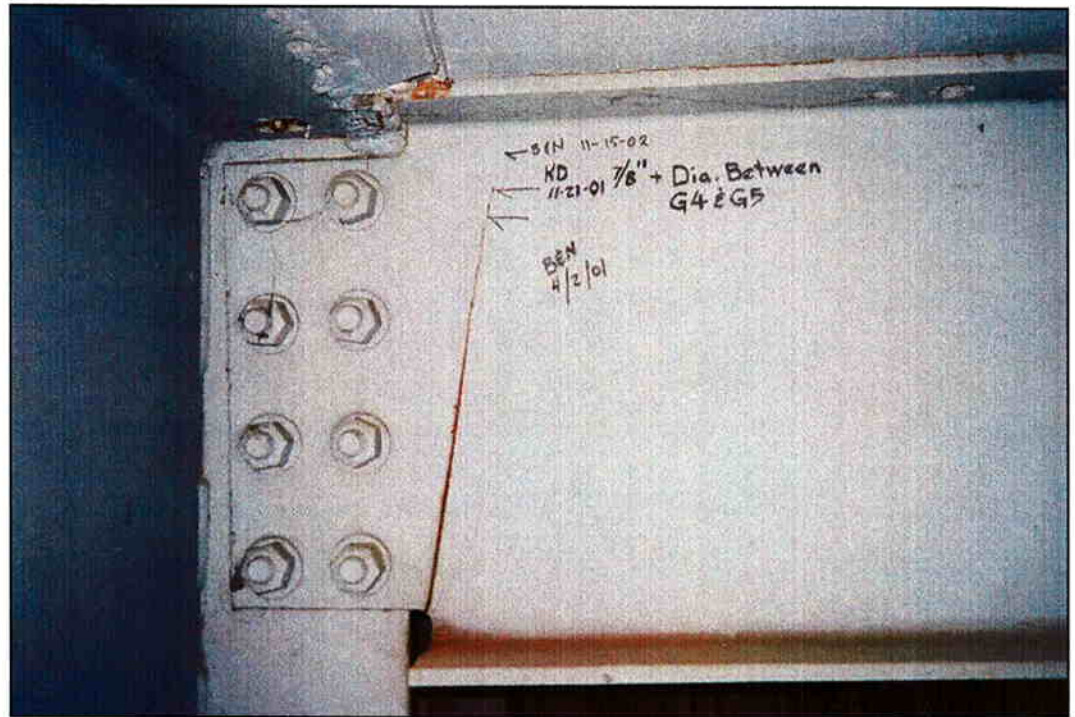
Looking south at diaphragm between girders 4 and 5 at the lower deck south abutment. Note crack in diaphragm web has grown from 13 inches in April 2001 to 15 1/8 inches over 19 months.
